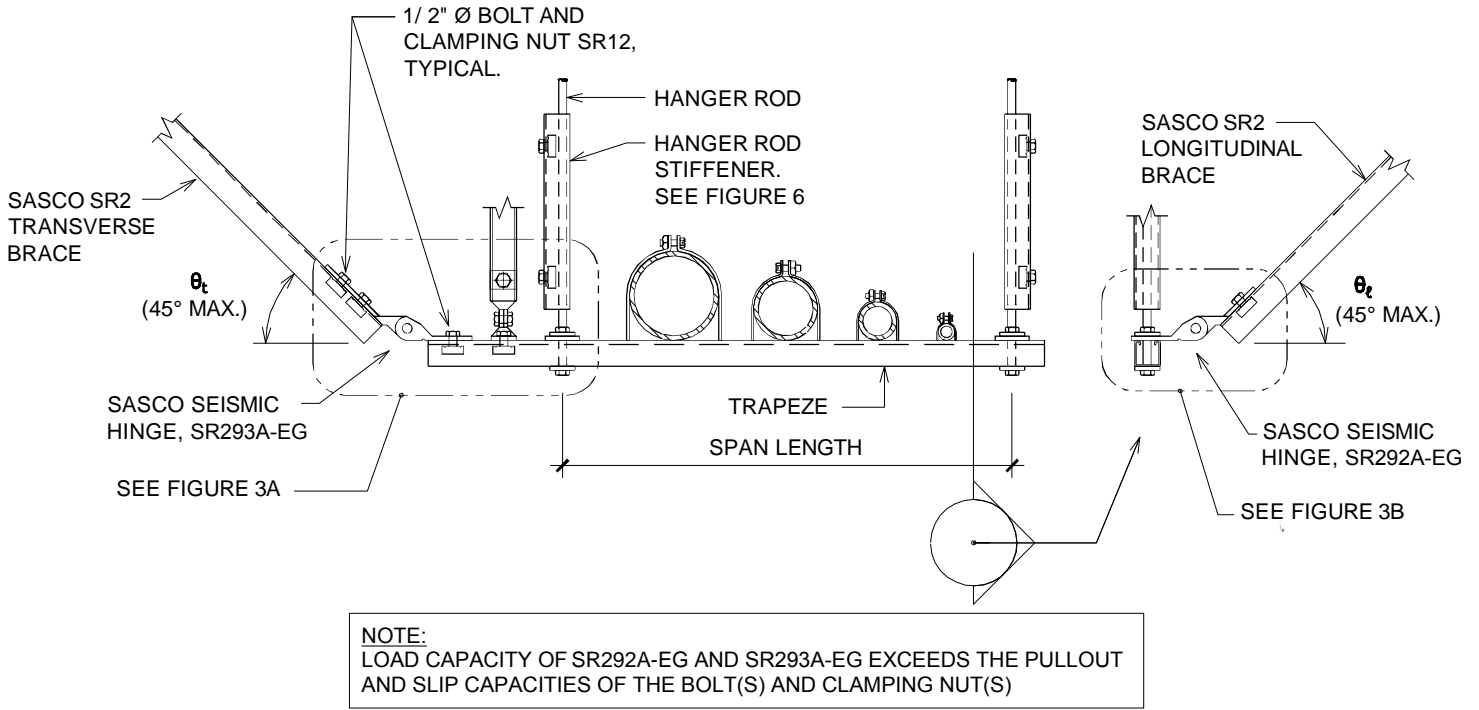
Typical Trapeze with Transverse and Longitudinal Braces
